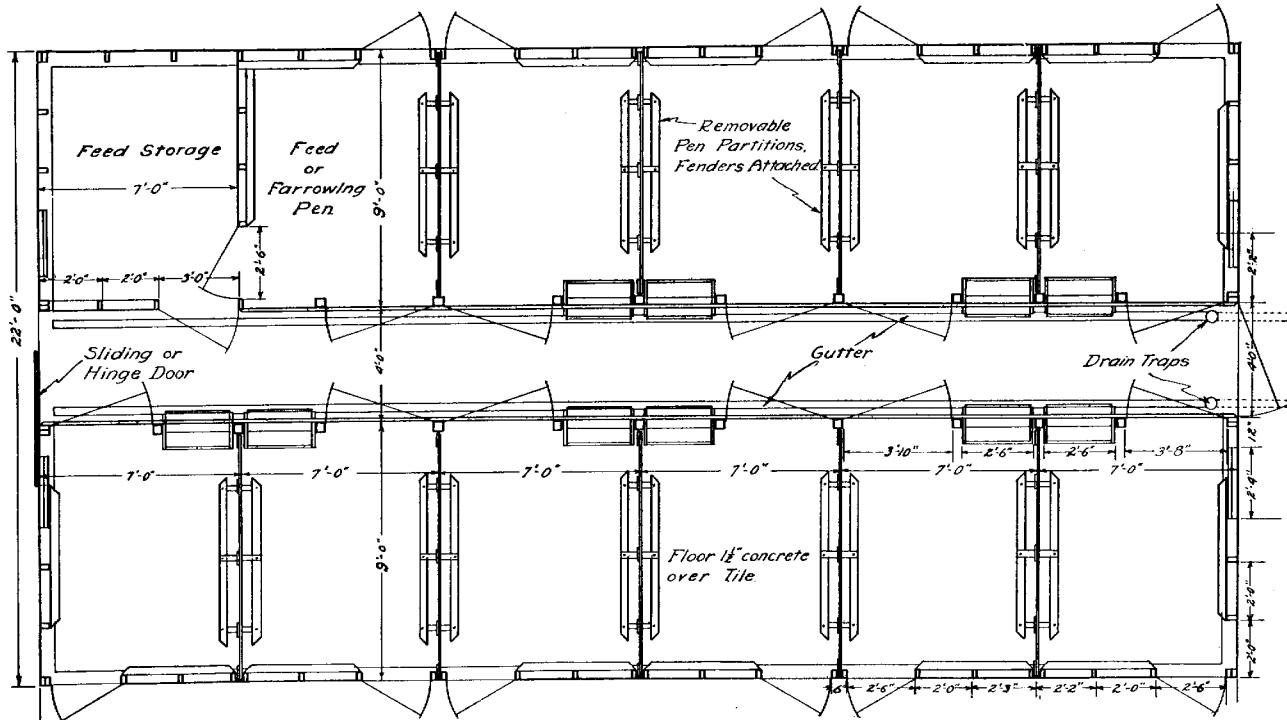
Floor plan of 12-pen farrowing house. (Outside view and sectional views are shown in figures 1 and 3. This house can be enlarged in units of four pens.)
